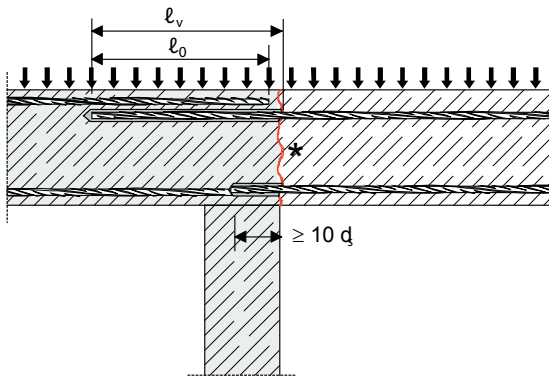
Overlap joint in foundation of a column or wall where the rebars are stressed in tension.
